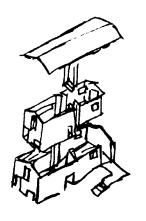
MODIFIED FLOOR PLAN: Weatherbee, Hailey. Uxbridge Ontario, 2013.
